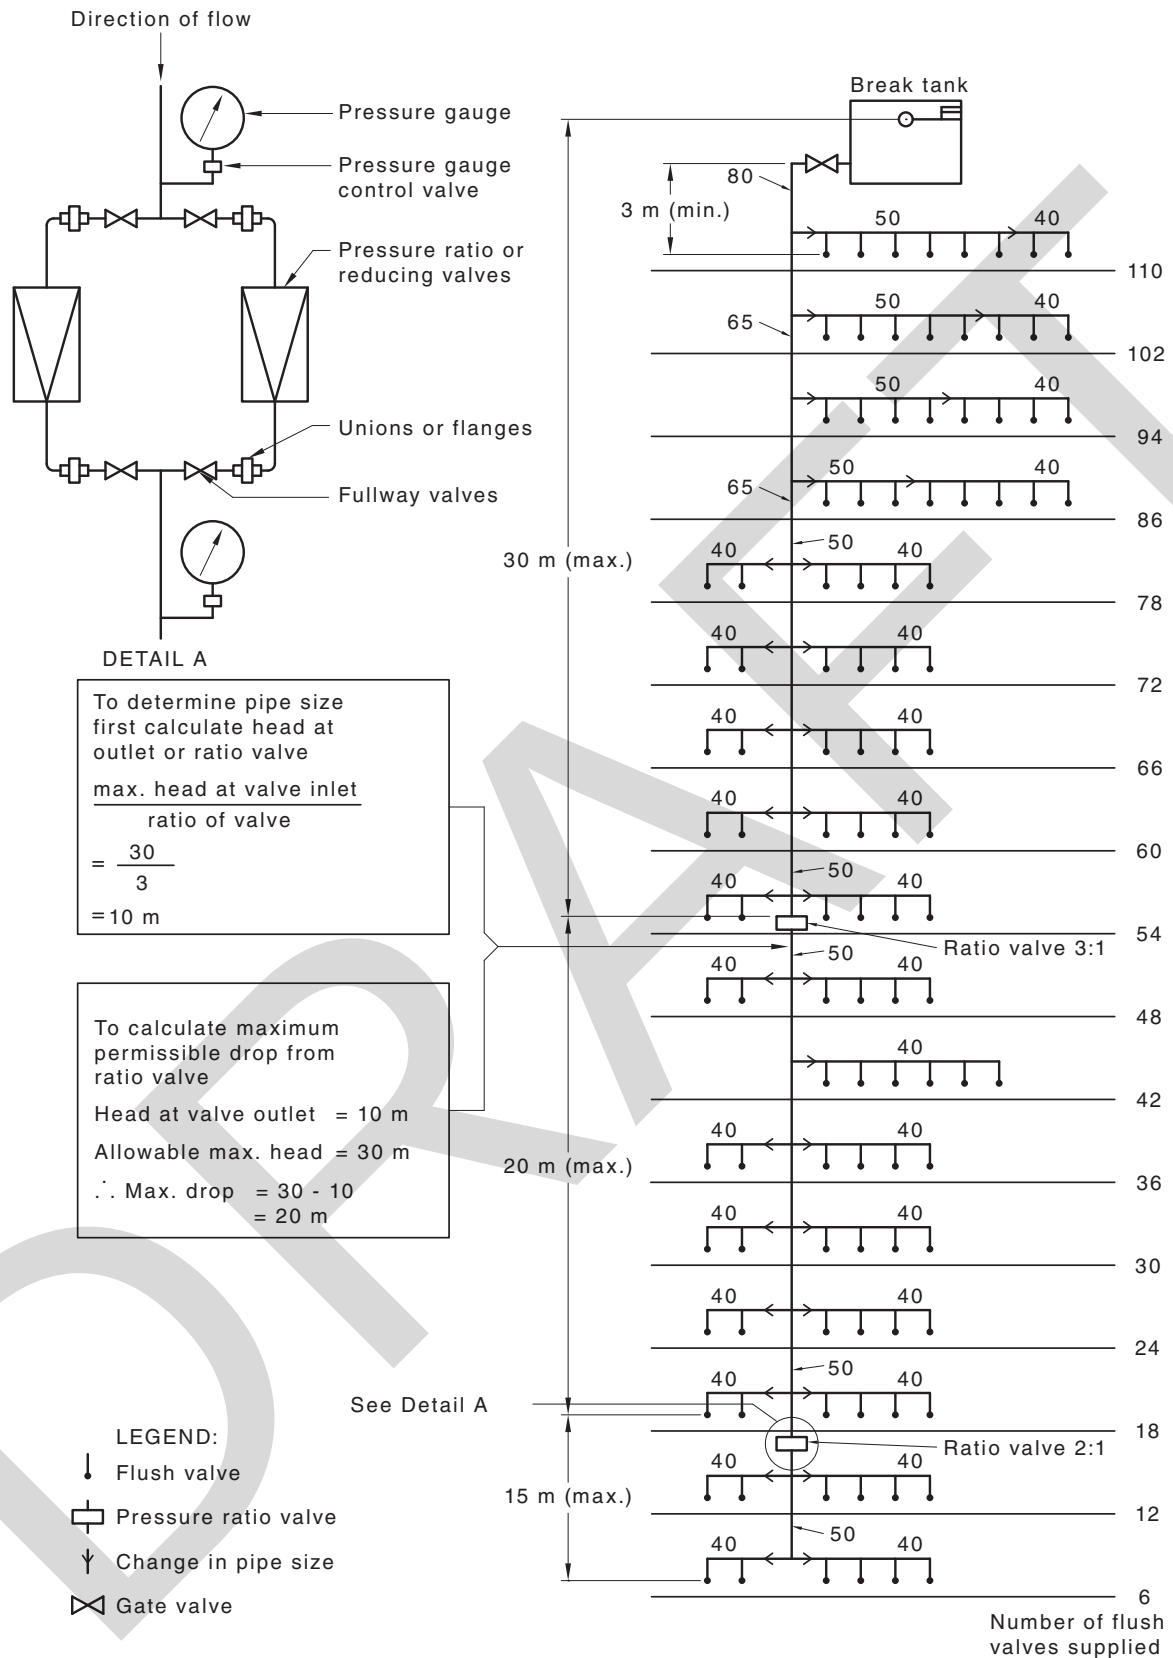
TYPICAL FLUSH VALVE INSTALLATION
